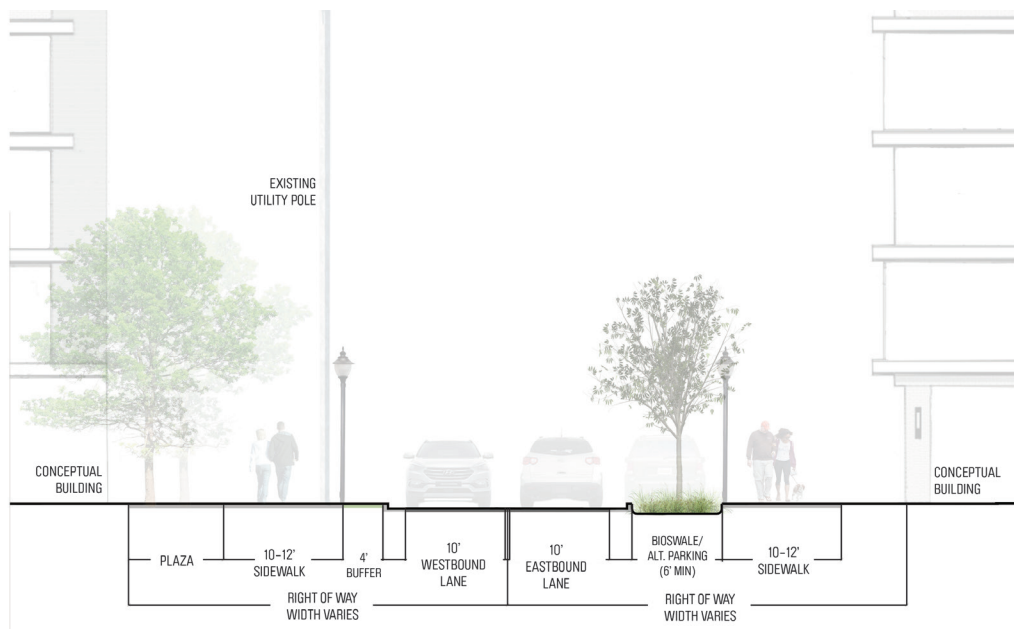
Proposed Hilderbrand Drive Cross Section
